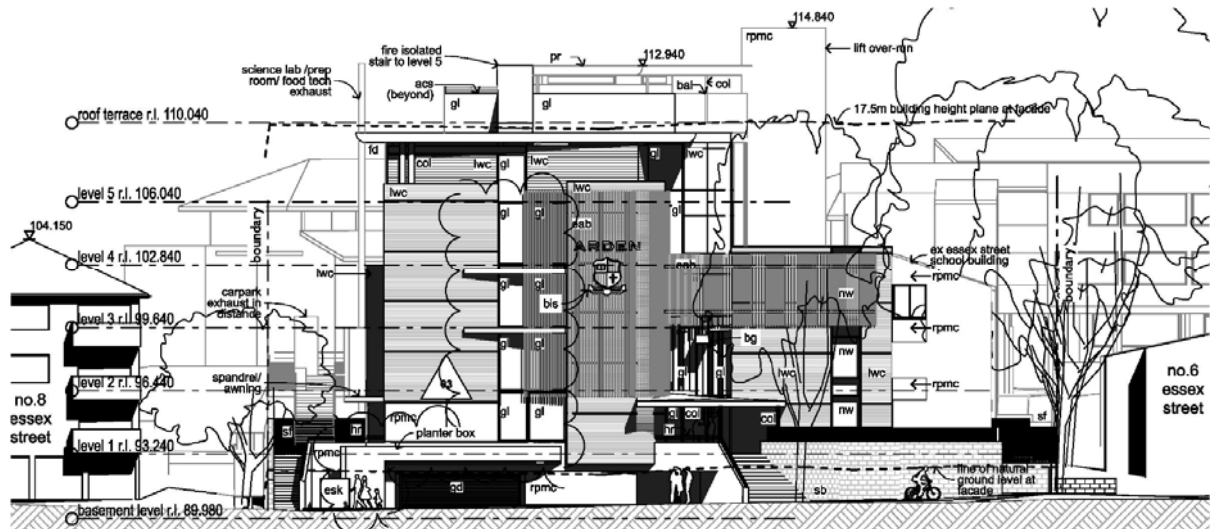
Approved Essex Street elevation under DA/89/2017.
